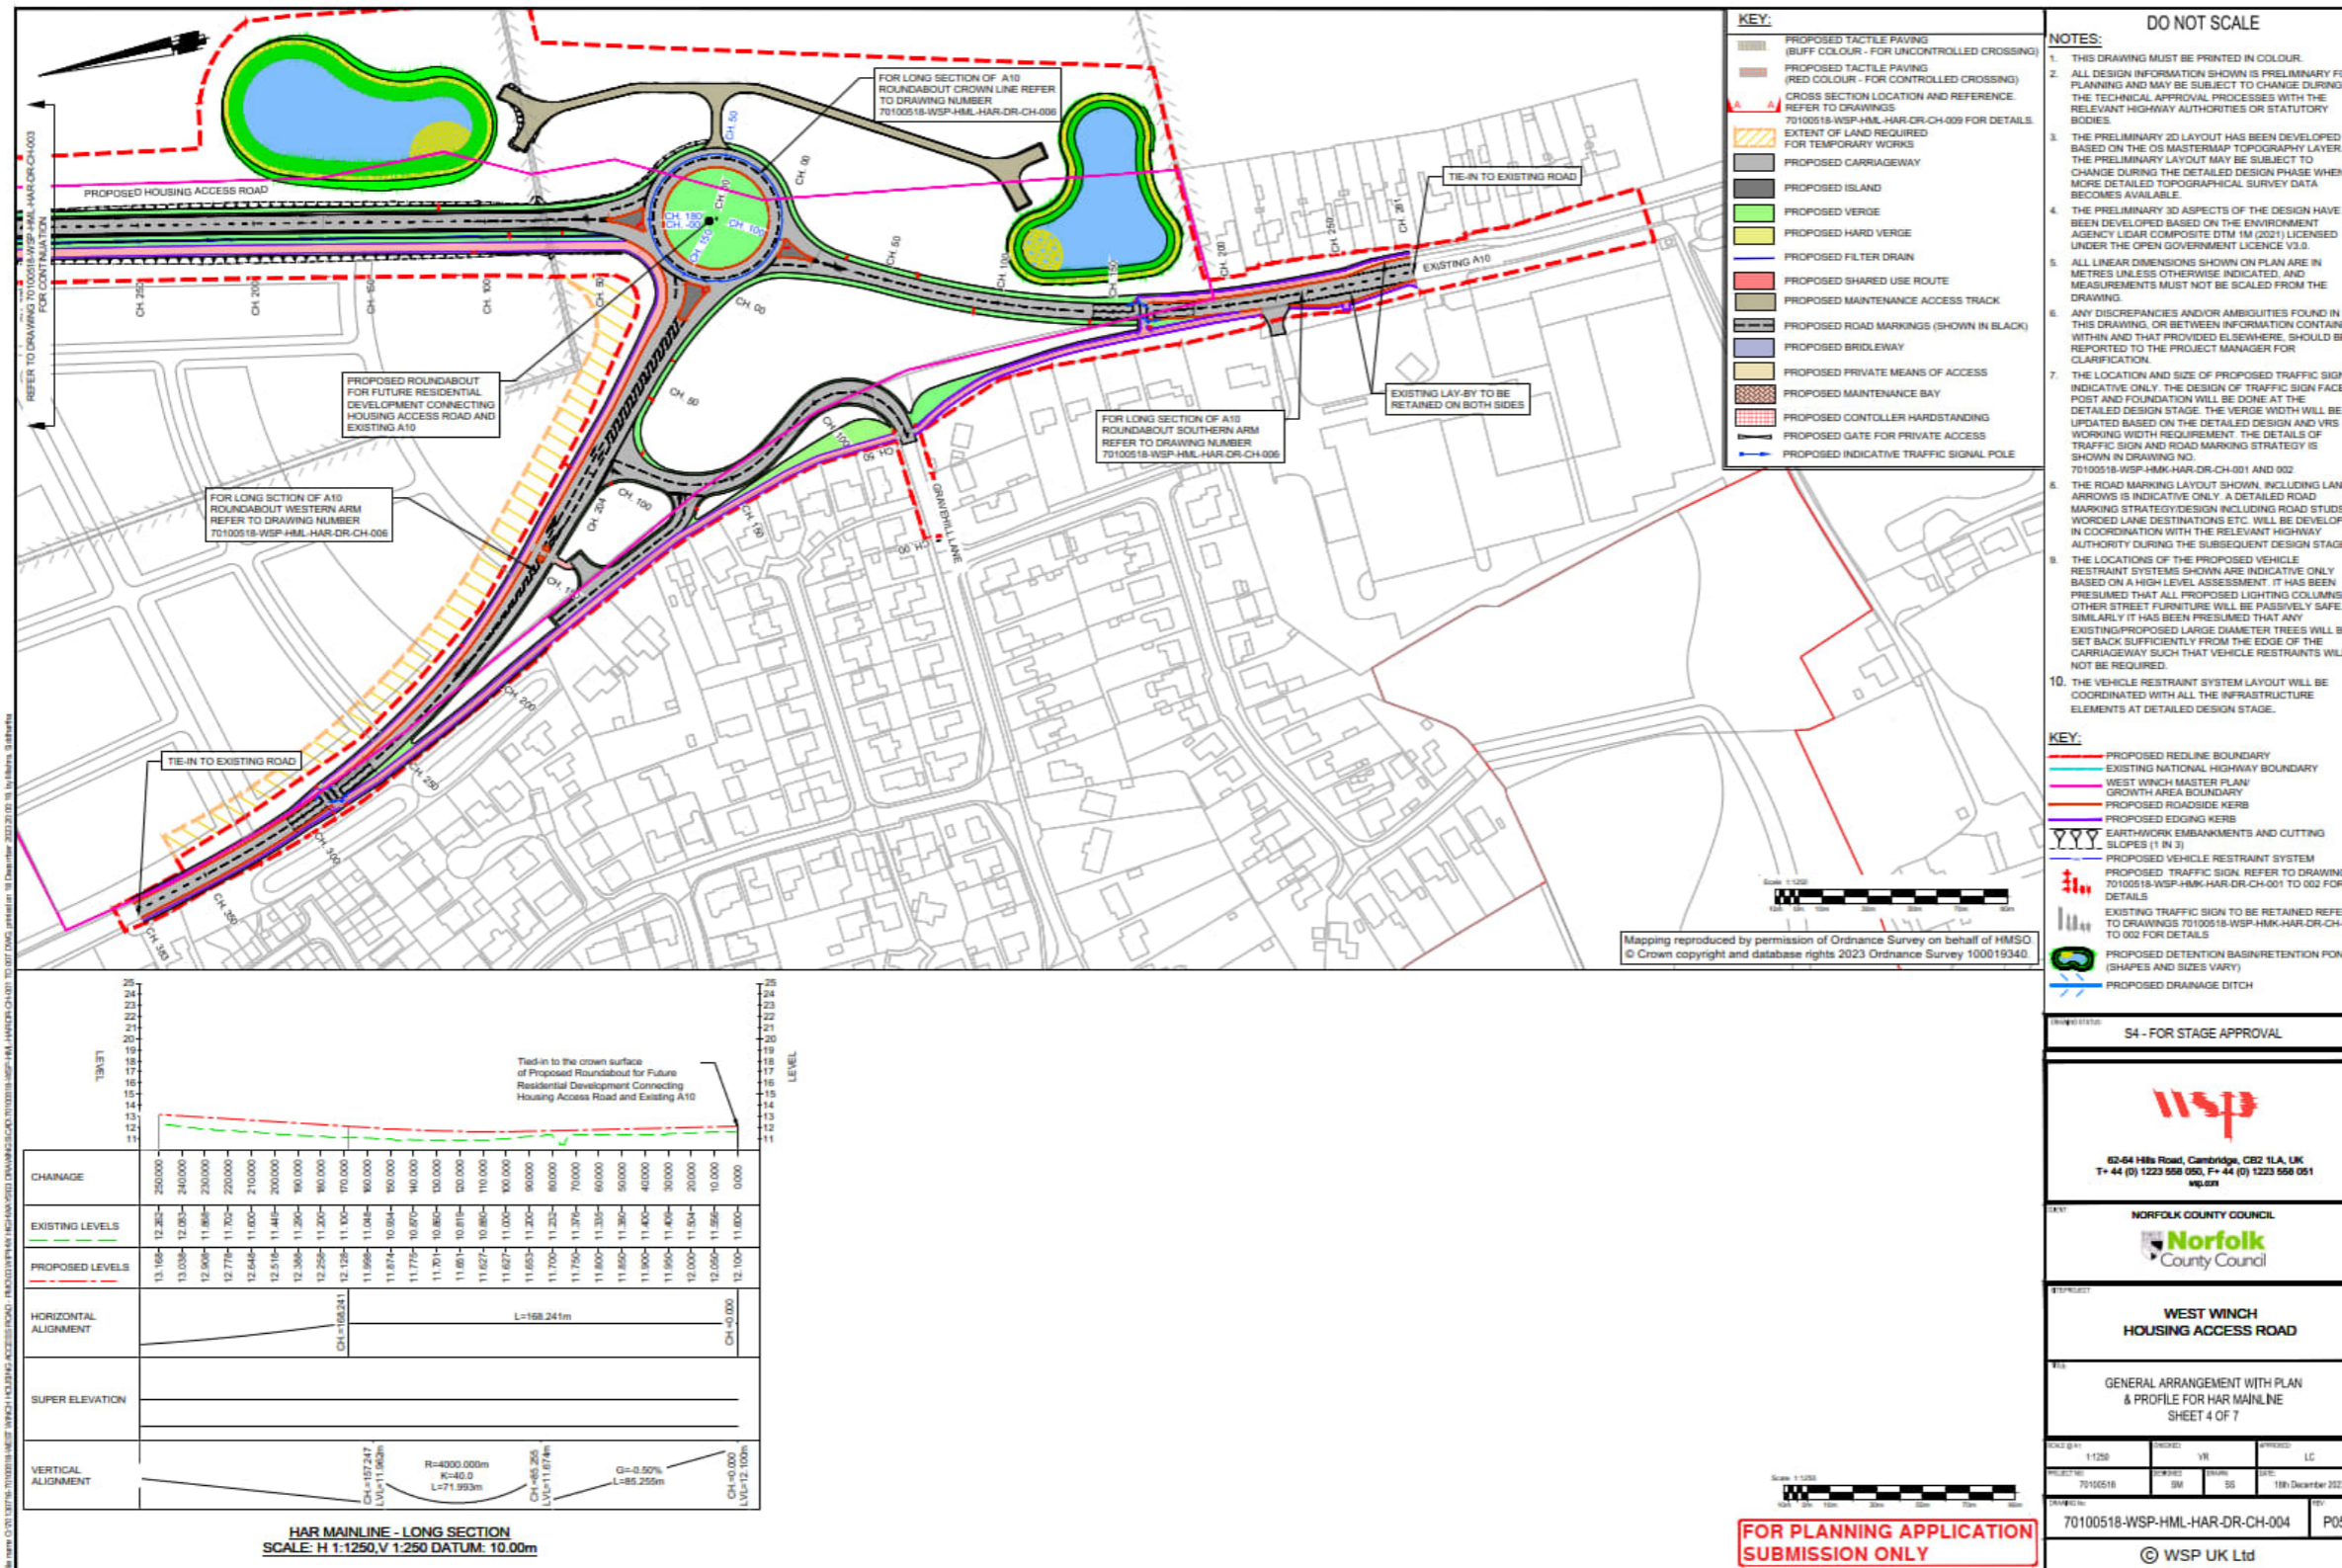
General Arrangement Plan and Profile for HAR (Sheet 4 of 7)
